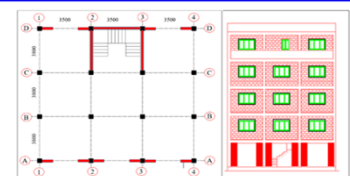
Retrofit plan for the soft first story of model NBC+ building. A combination of RC shear wall and wing wall controls excessive inelastic drift with usability of open space.
